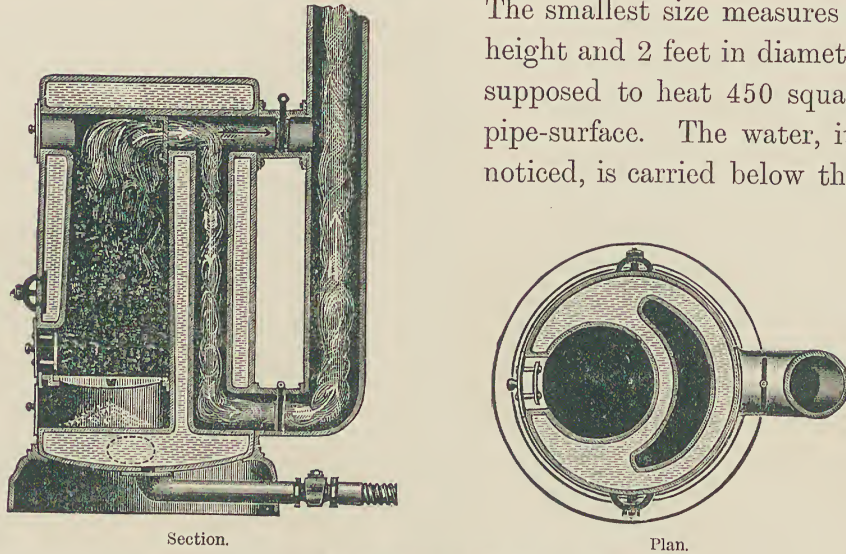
Plan and Section of the "Marlor" Boiler.
